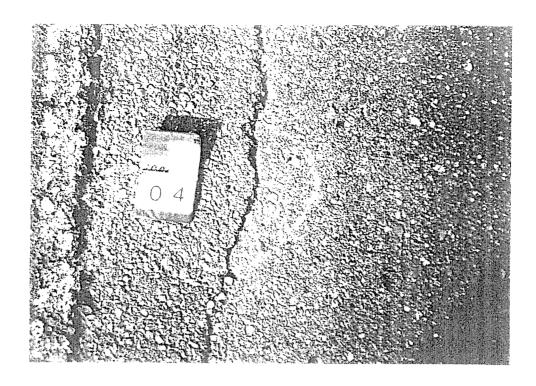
"Before" - Loose Debris and Dirt Film Removal Using Vacuum Blast Method
